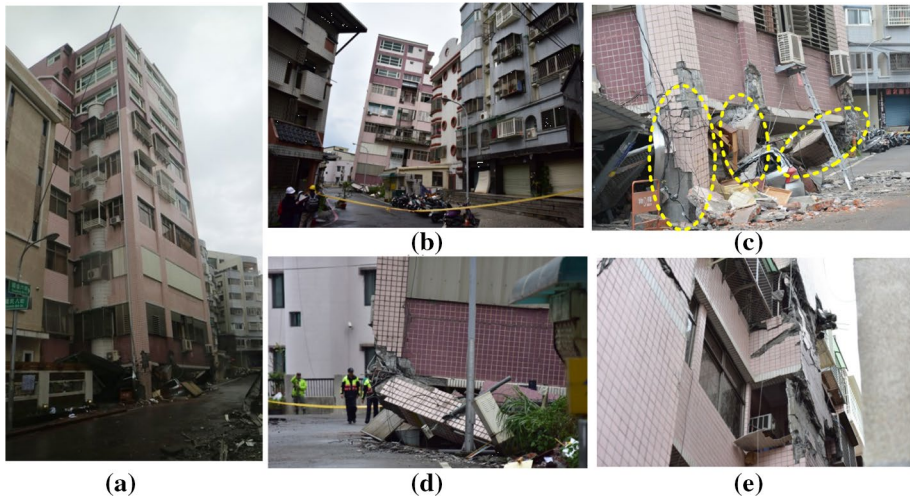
a Front and b back views of the collapsed 9-story apartment building. c and d Close-up photographs of the bottom story shown in a and b, respectively. e Exterior walls of the collapsed building
